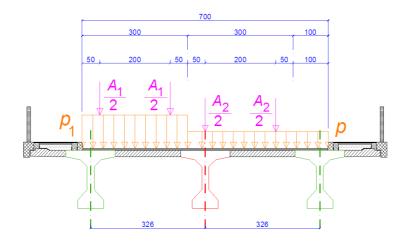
Traffic loading on the actual bridge (annotations in cm)
